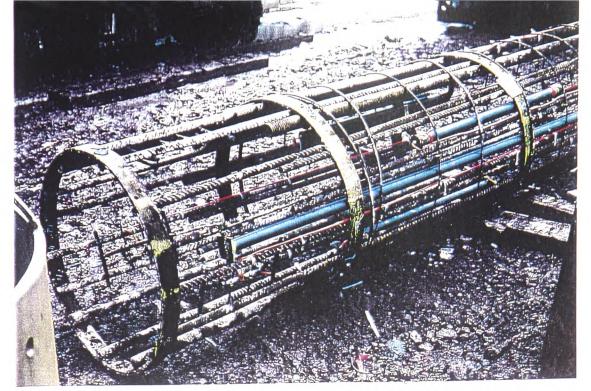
Assembling the pile reinforcement and installing the extensometers
